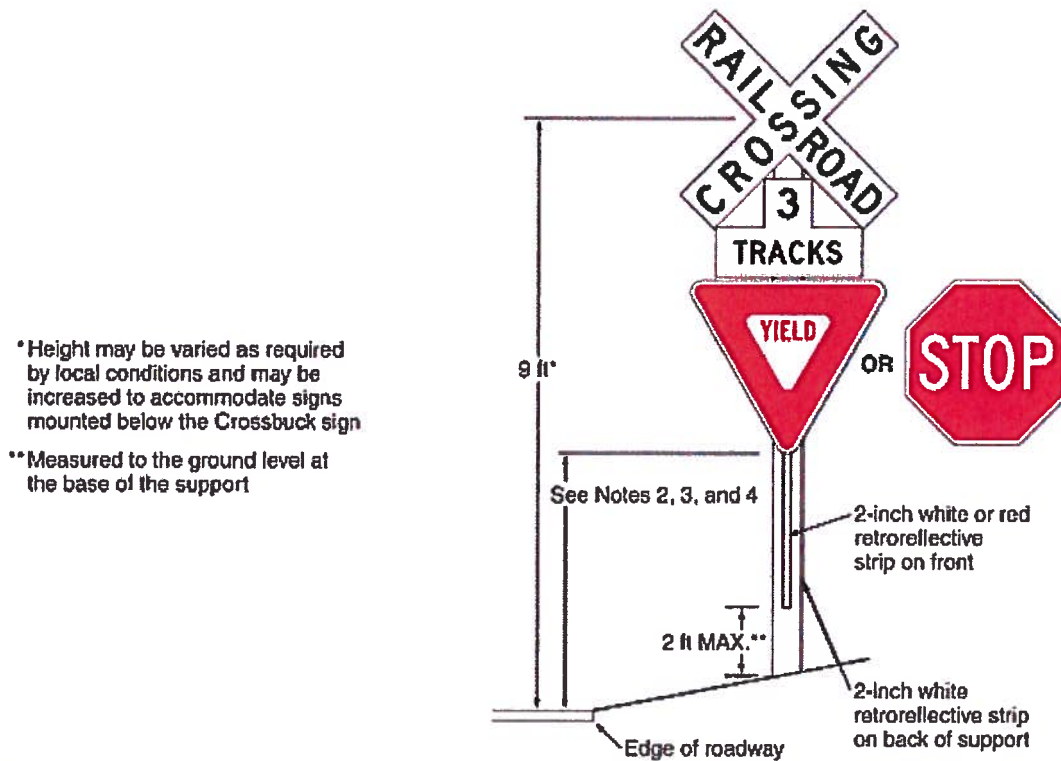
EXHIBIT 'B' (STANDARD DRAWINGS AND PLANS)
